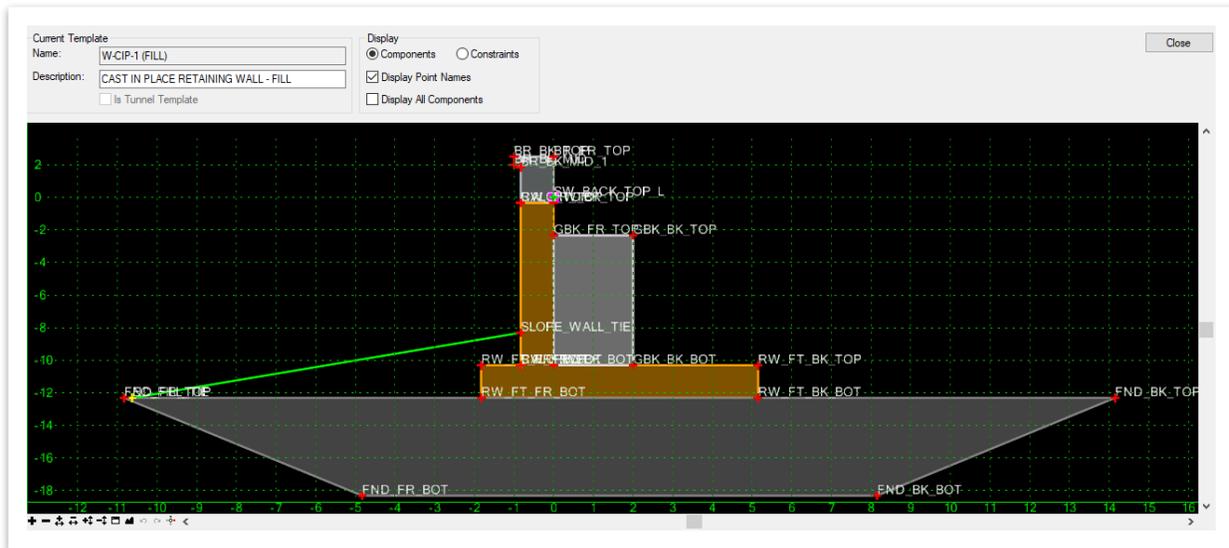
RETAINING WALL – FILL TEMPLATE
